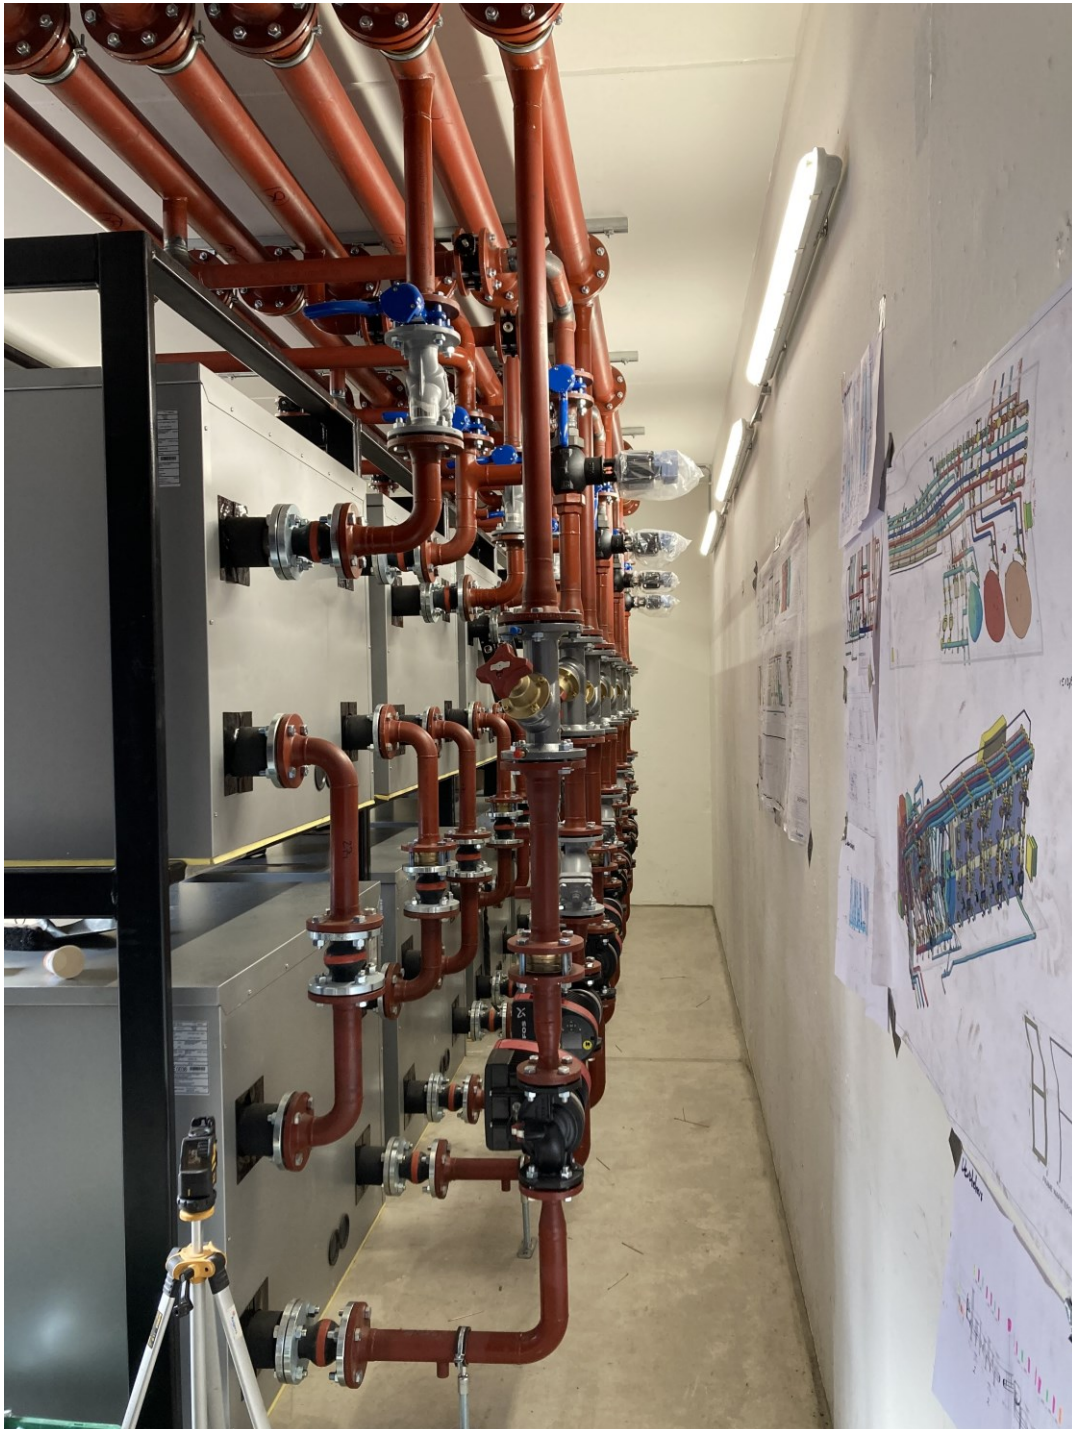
The skid mounted heat pump modules at the swimming pool.
